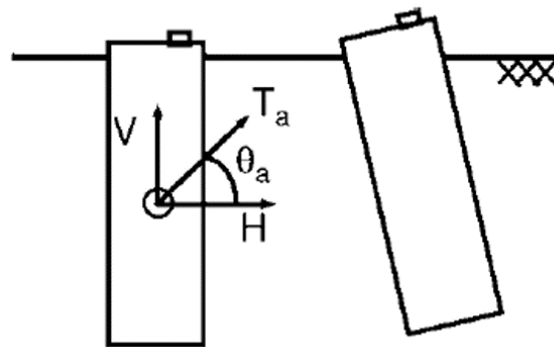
SUCTION ANCHOR FAILURE MODE[18]
